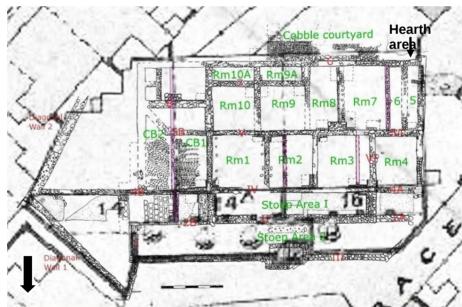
Overlay of the site plan on Thom's survey c1898. Late 19<sup>th</sup> century foundations are shaded purple. A hearth/cooking area was uncovered in the SW corner of the dwelling.
